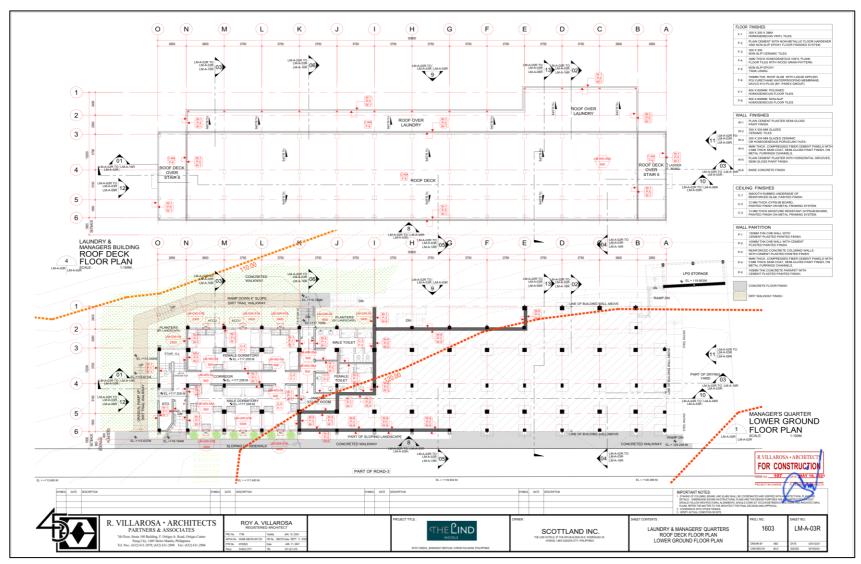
Lower Ground Floor Plan and Roof Deck Floor Plan
